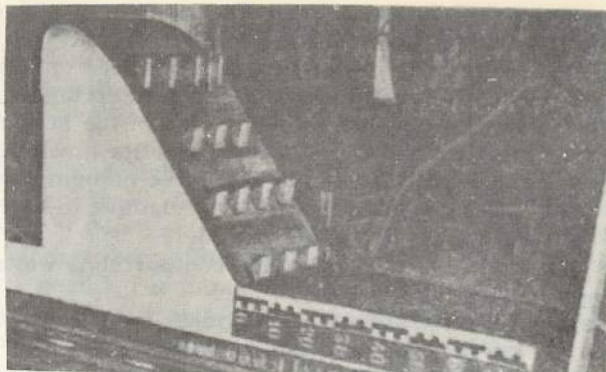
Spillway dam model with energy-dissipating chute baffles mounted on the spillway face
